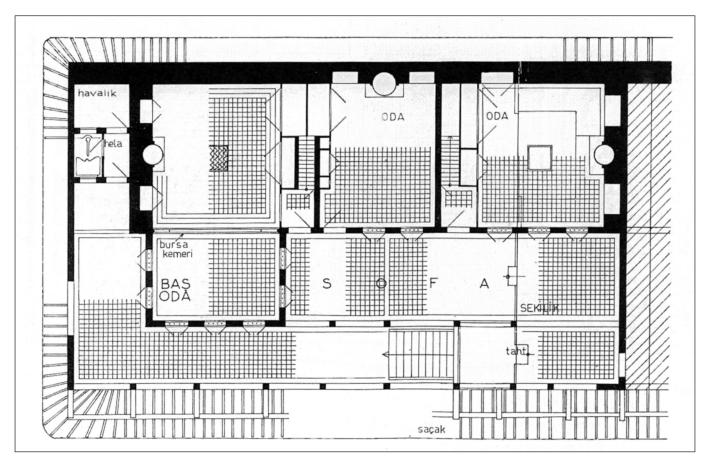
Ground plan of the upper floor of the Genç ağa house in Tekirdağ, 17th century (Eldem 1984, 74)
